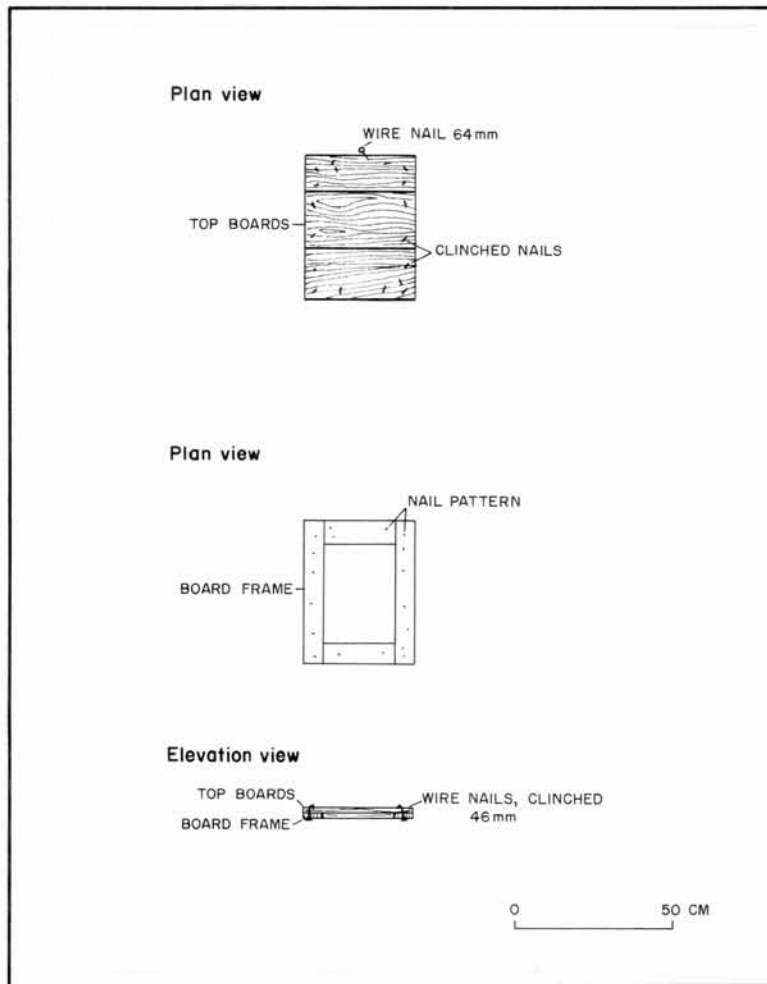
Photo view and drawing details of board assembly found inside powder magazine.
